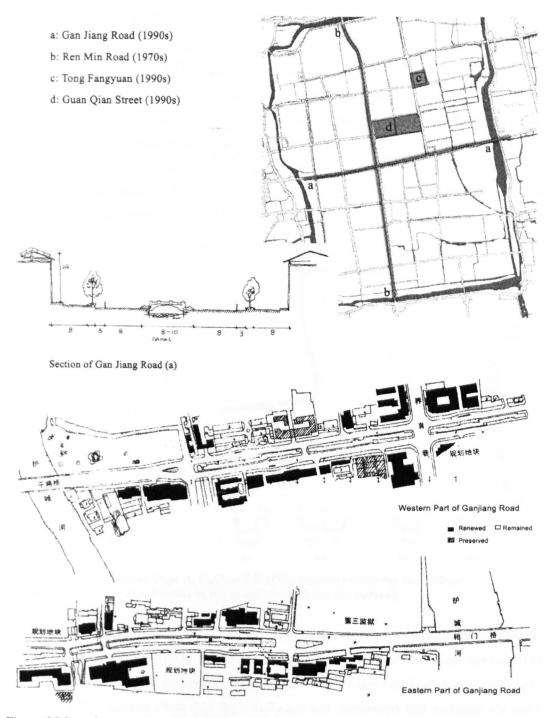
Sample streets locations, section and plans (adapted by the author, the plans of Gang Jiang Road come from (Tan and Qi, 1997, p36)
